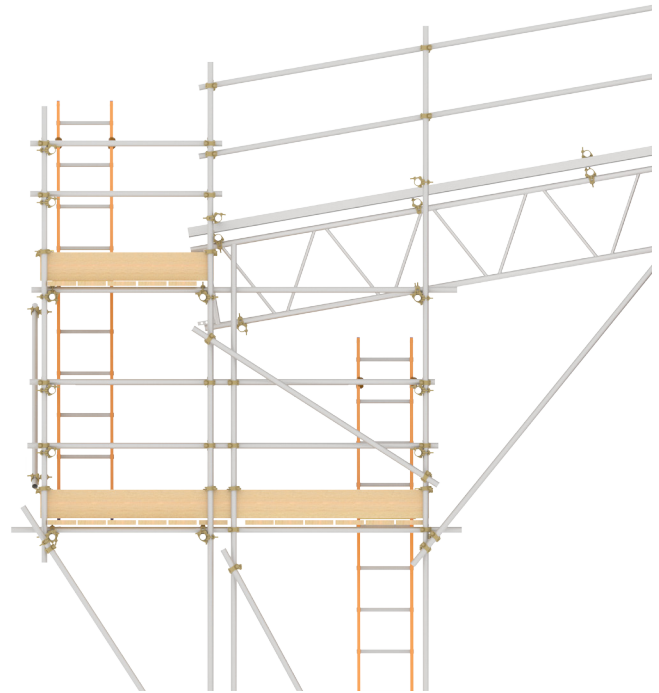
An example of safe access to the roof surface via a cantilevered eaves platform.
